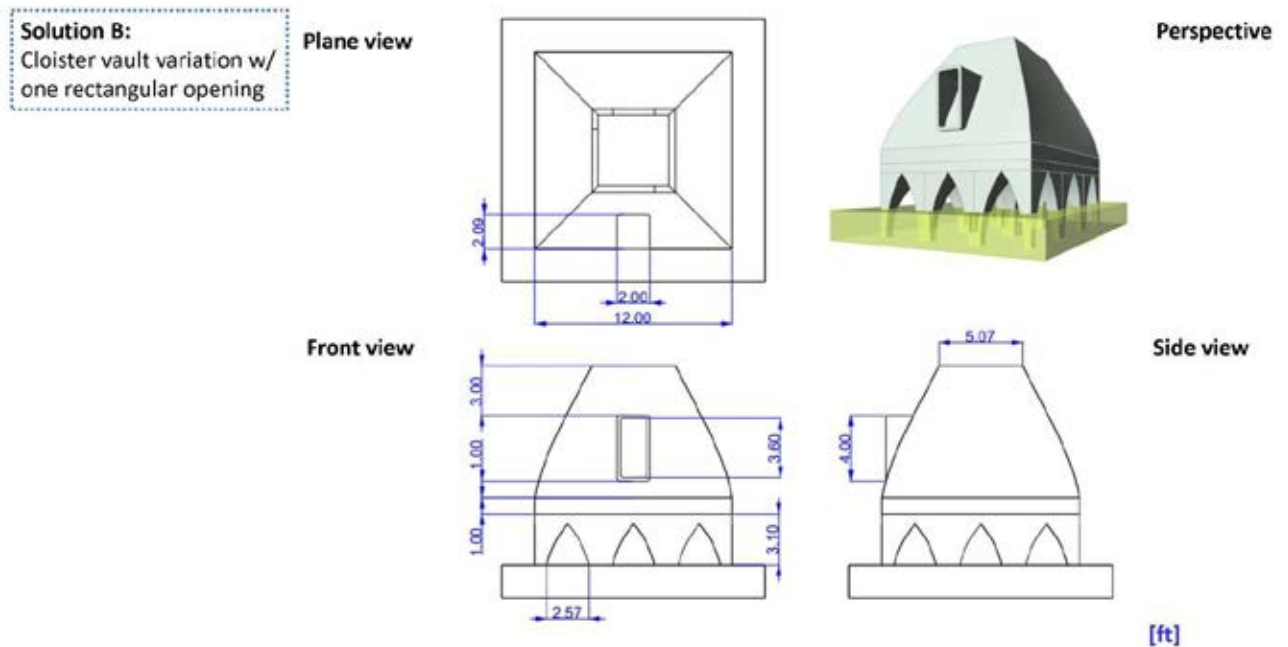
Solution B with a cloister vaulted structure and straight openings.
